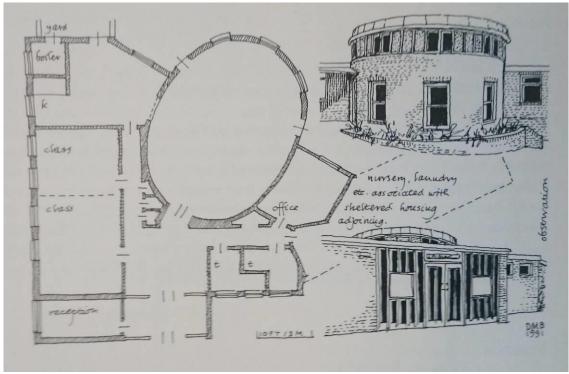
Ground floor plan of the meeting house as reconstructed by Butler (north is at the bottom; not to scale) (Butler (1999), vol. 2, p.700)
